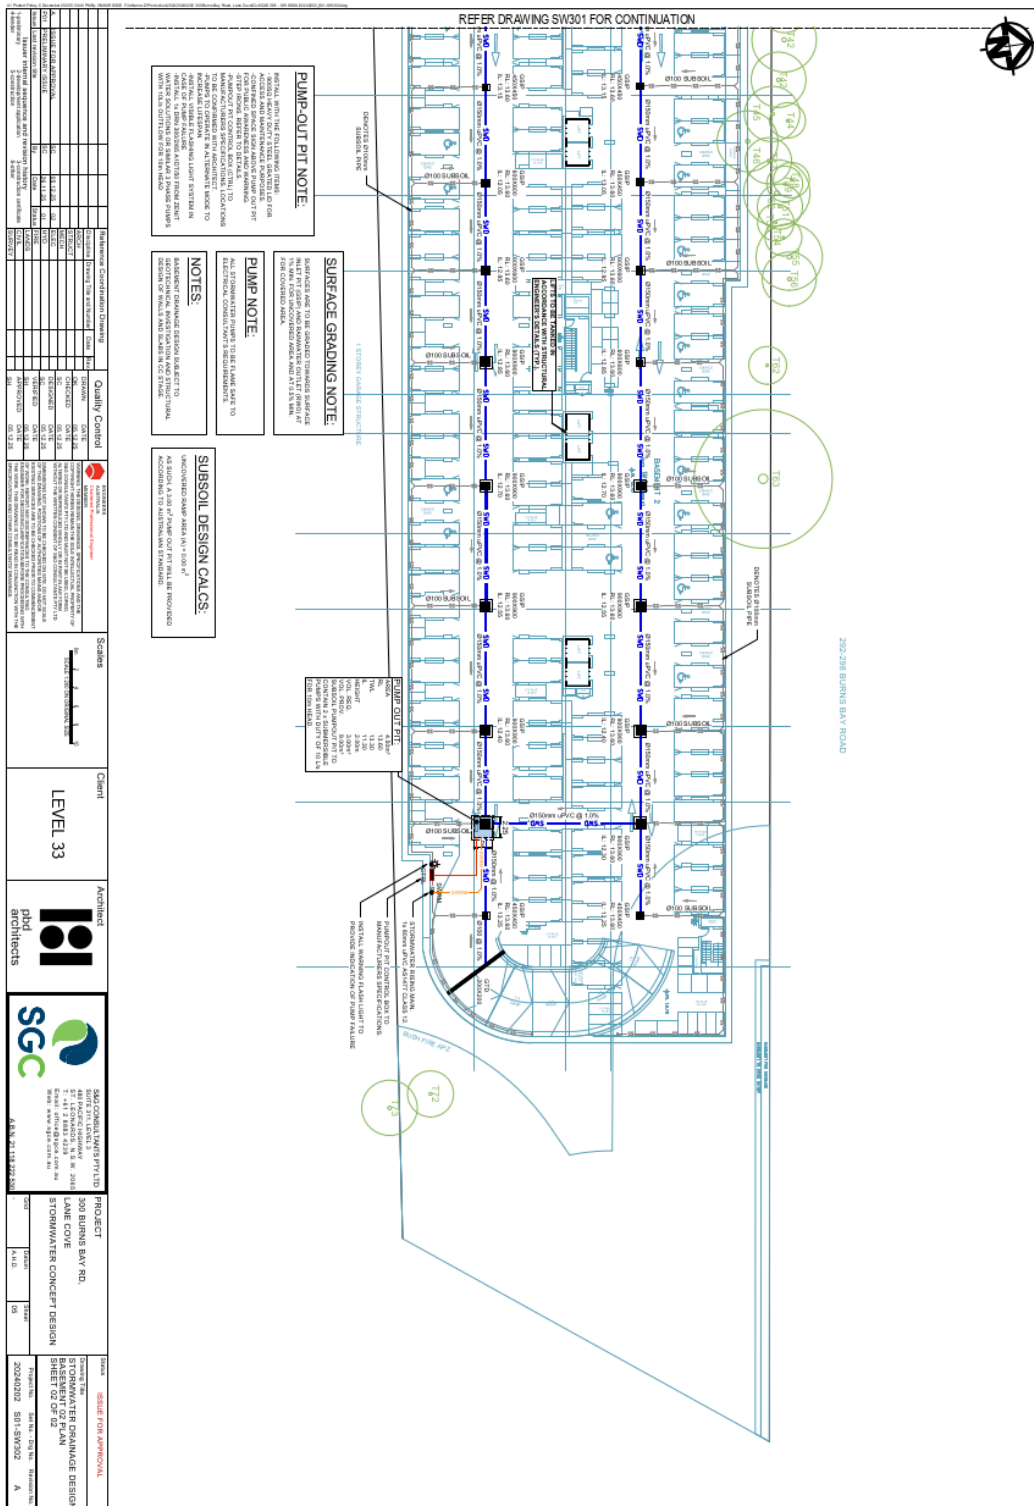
Stormwater Plan – Basement 2 – Sheet 2
